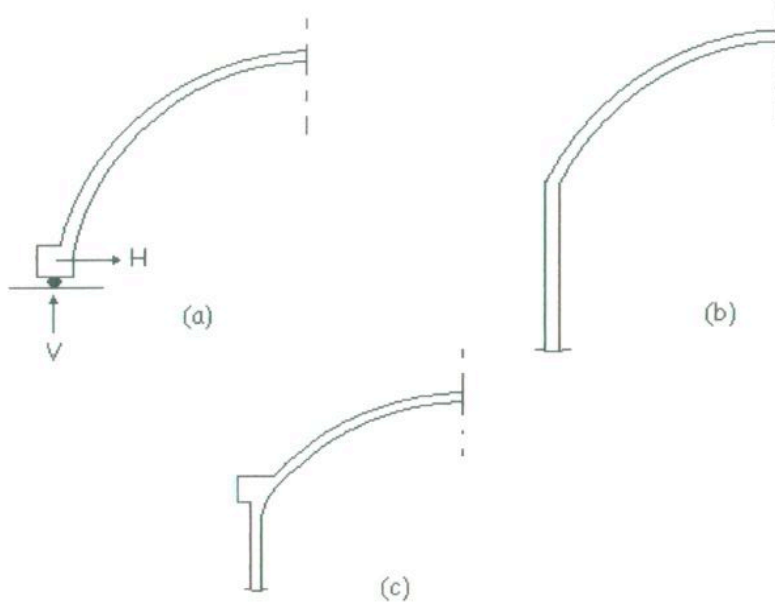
Dome Edge Constructions from Billington. (a) Dome-Ring Edge Construction, (b) Dome-Wall Edge Construction, (c) Dome-Ring-Wall Edge Construction.
